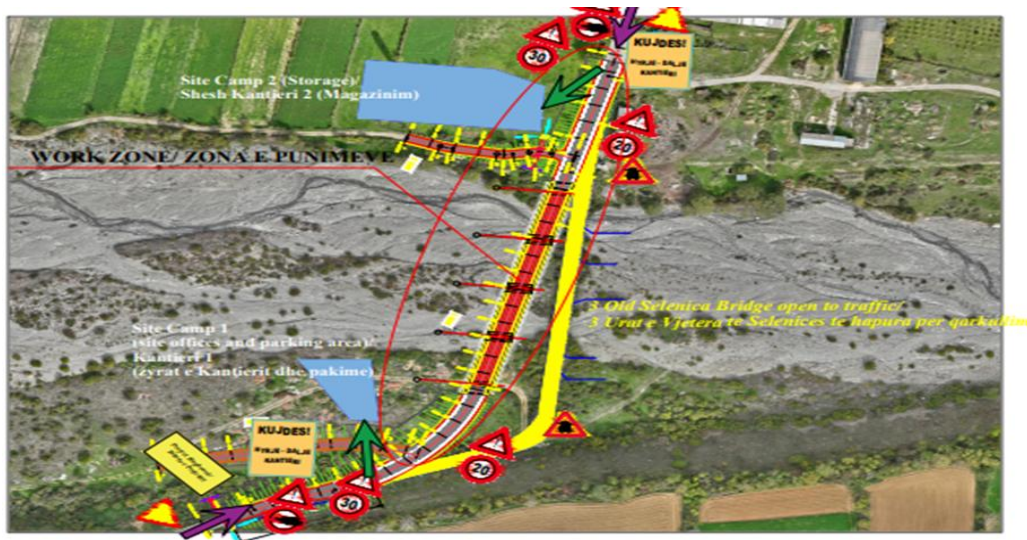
Site organization plan Selenica 1-2-3 Bridge
